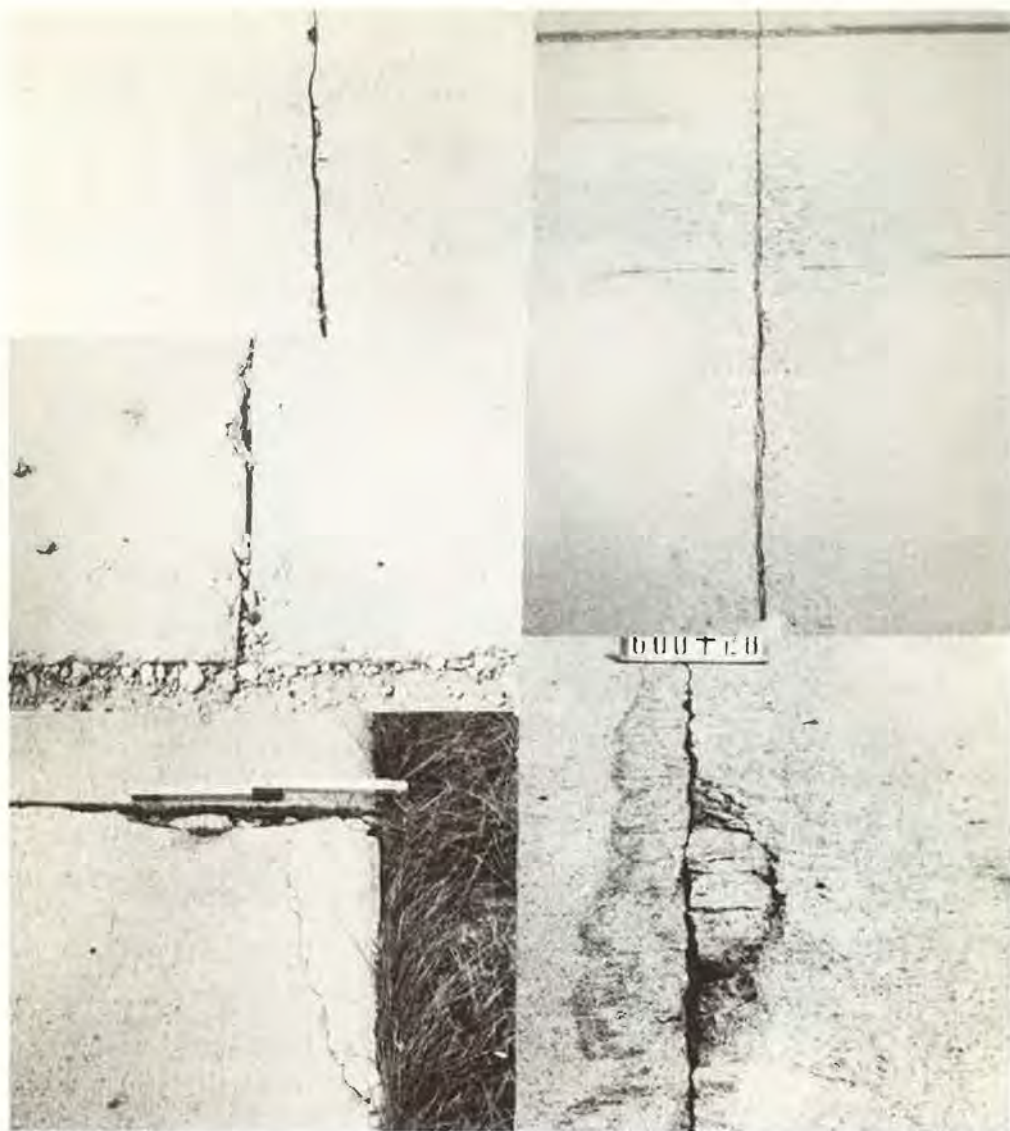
Typical failures common to contraction joints constructed with premolded fiber strips.
